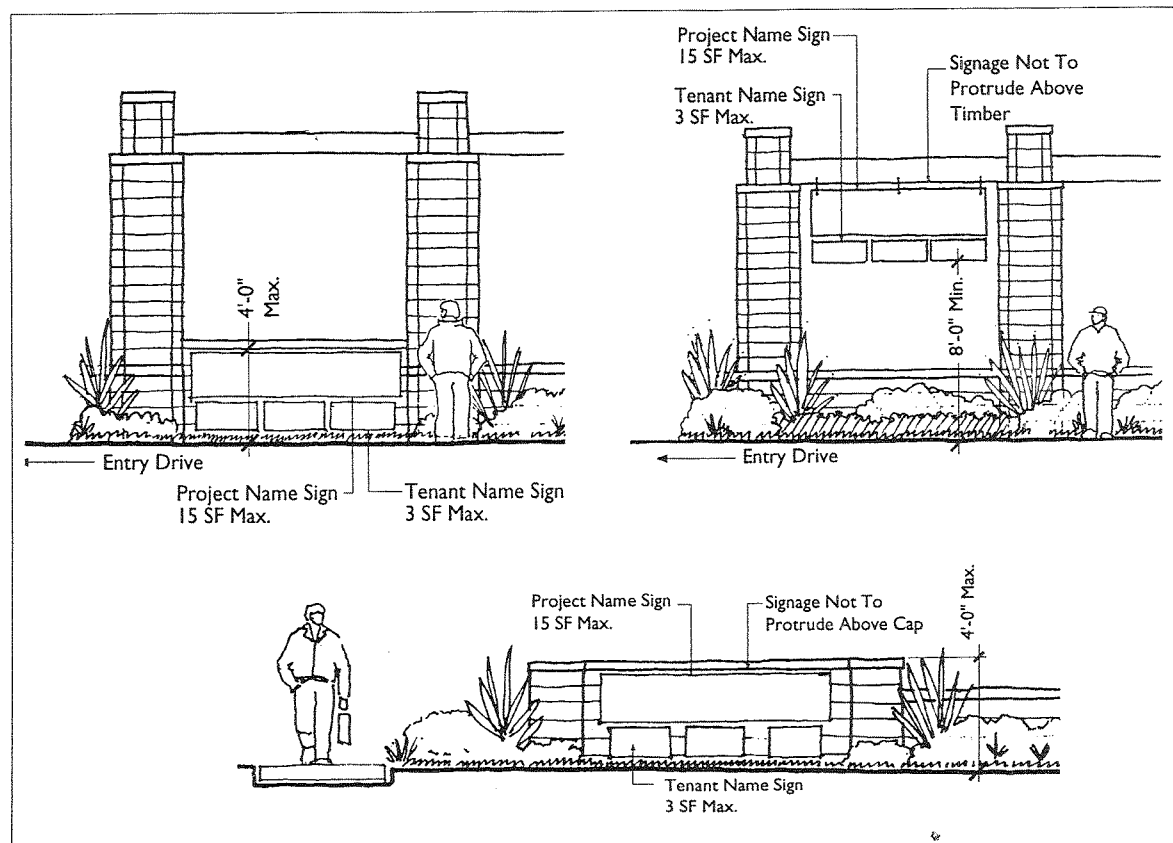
, Village Wall Signs, Size and Placement. Project name signs and tenant signs should conform with the requirement set forth in Table 8. These signs should also be integrated with the Village Wall and appear as panels that either hang from the horizontal timber or are applied to the face of the low wall. (The low wall may be up to 48 inches in height to accommodate signs in these limited locations.)
